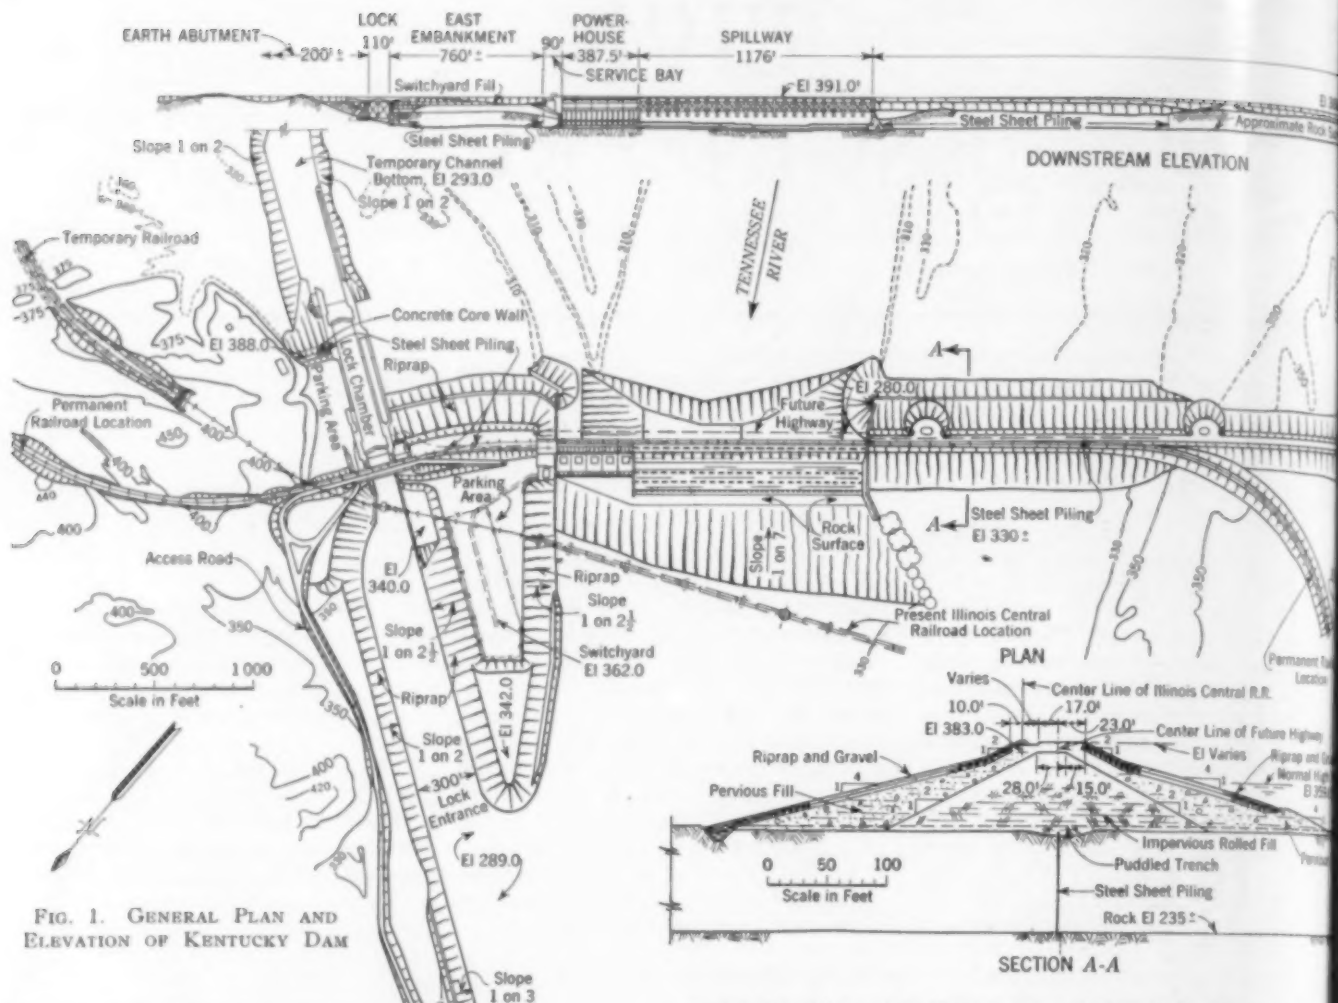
GENERAL PLAN AND ELEVATION OF KENTUCKY DAM
